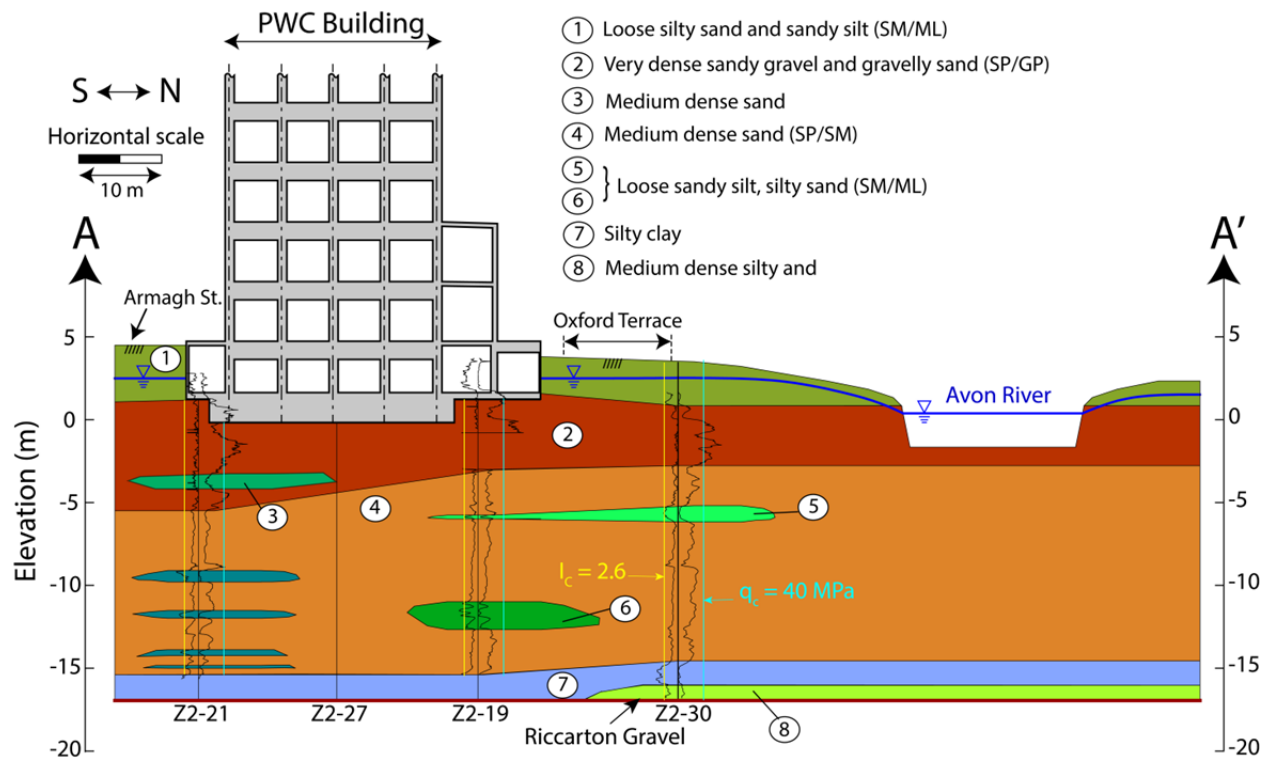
N-S cross section A-A' with the geotechnical profile of the PWC building including the building.
